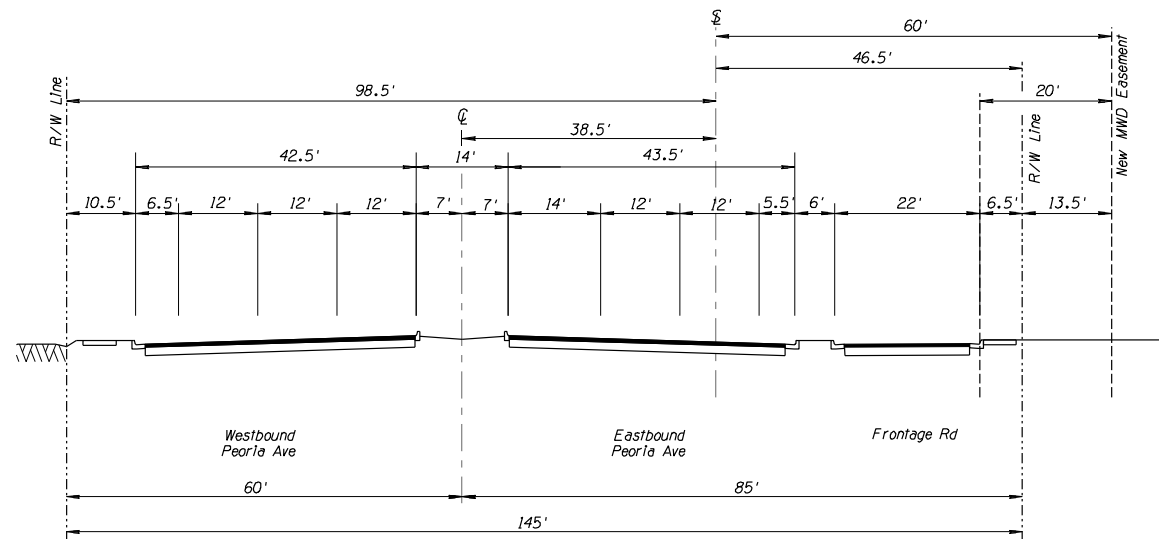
Narrow Hybrid with Frontage Road Typical Section
